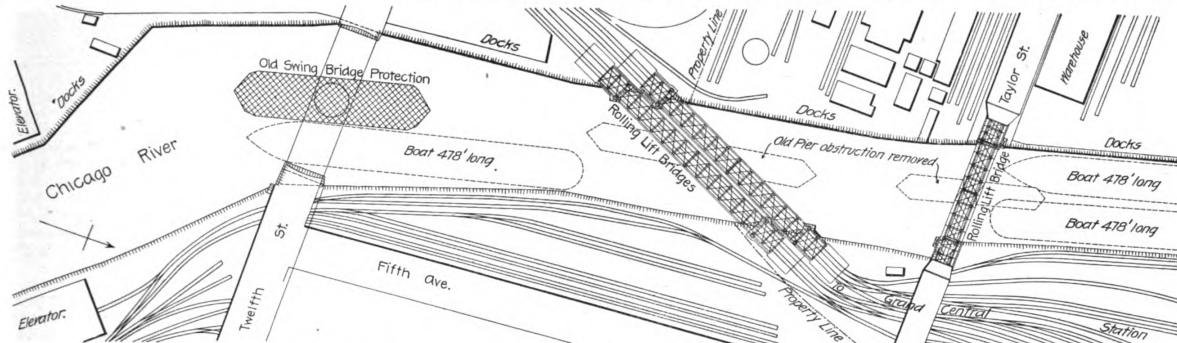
Plat Showing Pier Obstructions Removed by New Scherzer Rolling Lift Bridges, Chicago.
